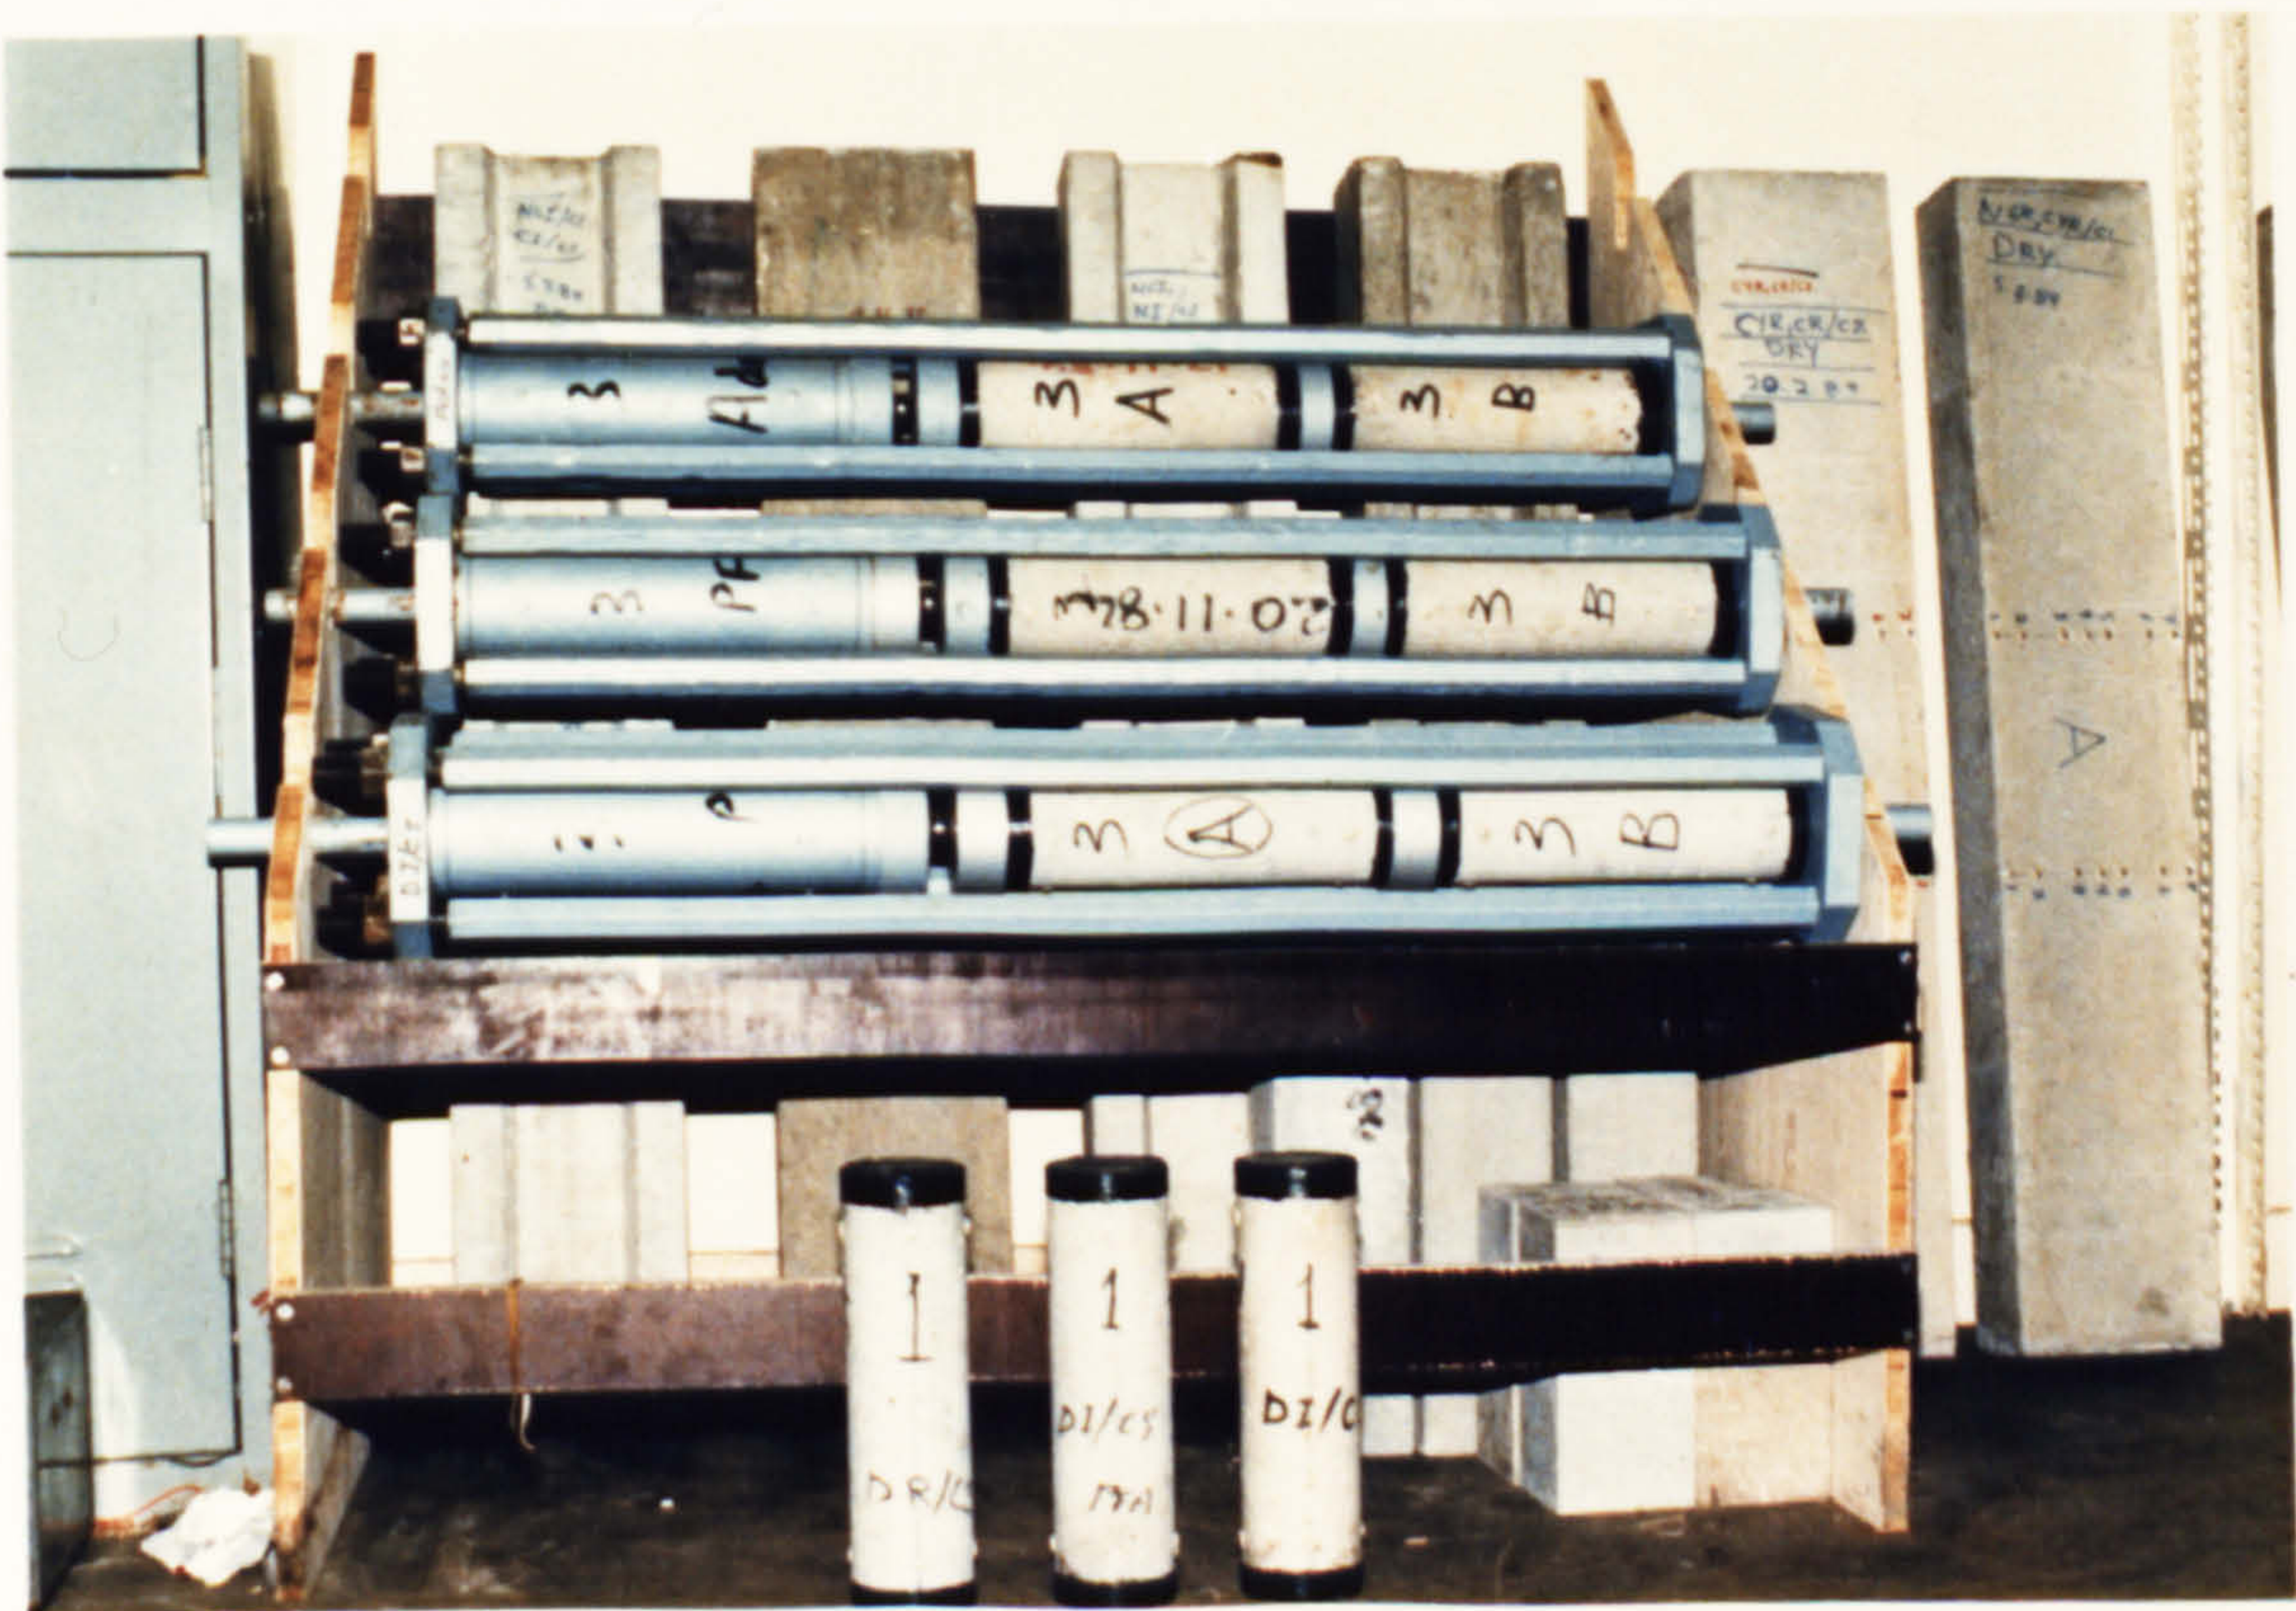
Typical view of creep rigs and shrinkage beams and cylinders
